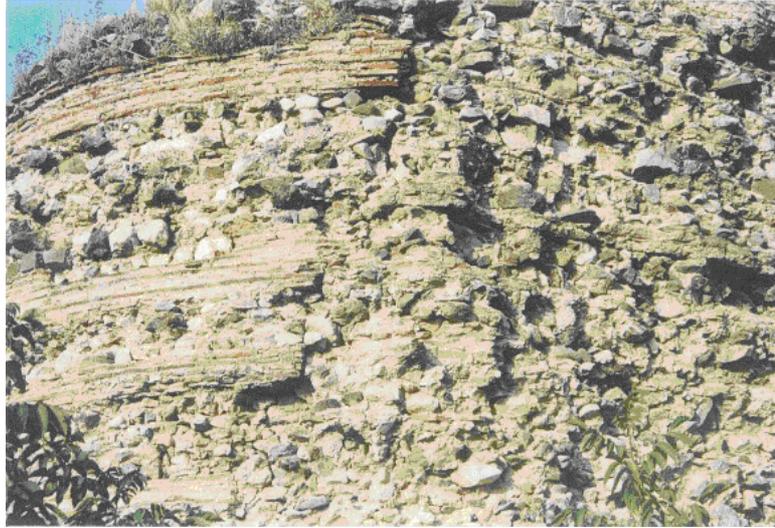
Tower of the outer wall , in front of Tower 106, İznik, rubble core
